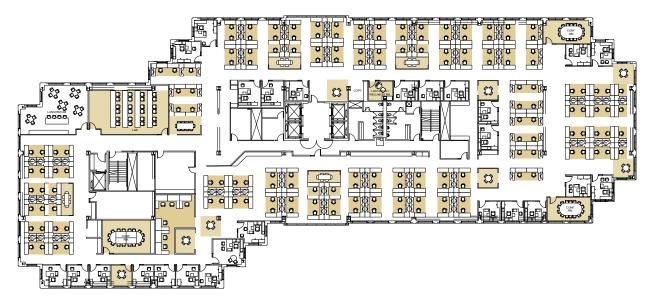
Test fit plan, Eden (24100 Amador Street), Floor 4
